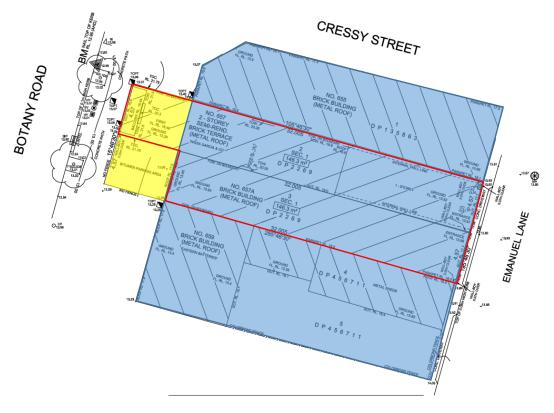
Survey plan demonstrating existing structures on the site within SP2 zoned land (yellow) along Botany Road and the location of B4 Mixed Use zoned land (blue).
